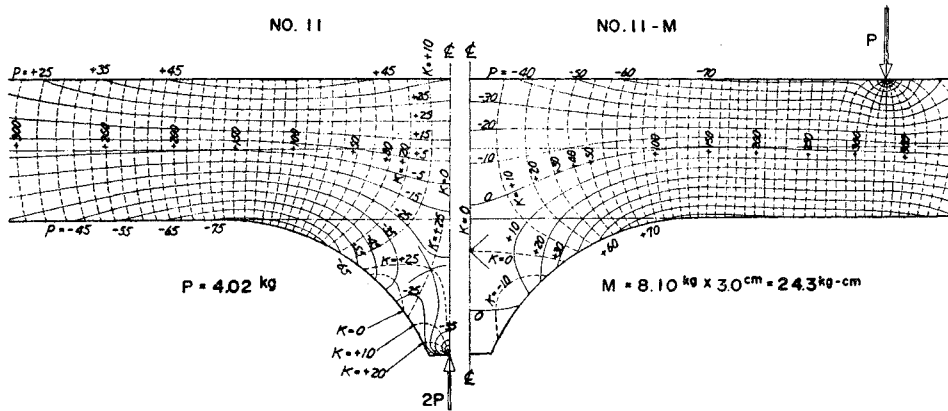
p - K Networks in Supporting Parts of Girder Bridge with Haunch $r=3.20$ cm
